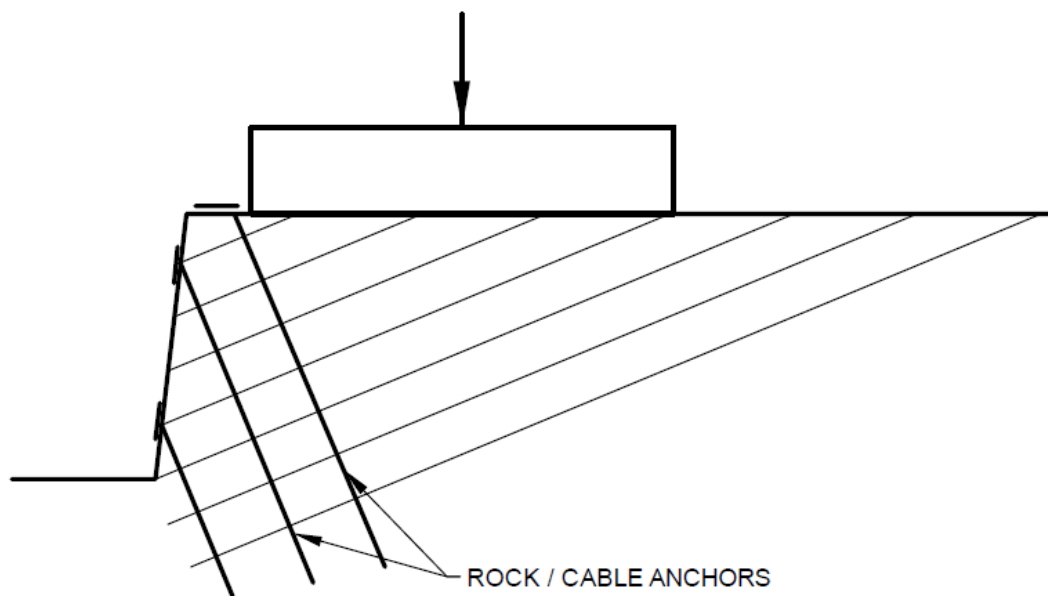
FOUNDATION OF STEEPLY DIPPING STRATA ON A BENCH
